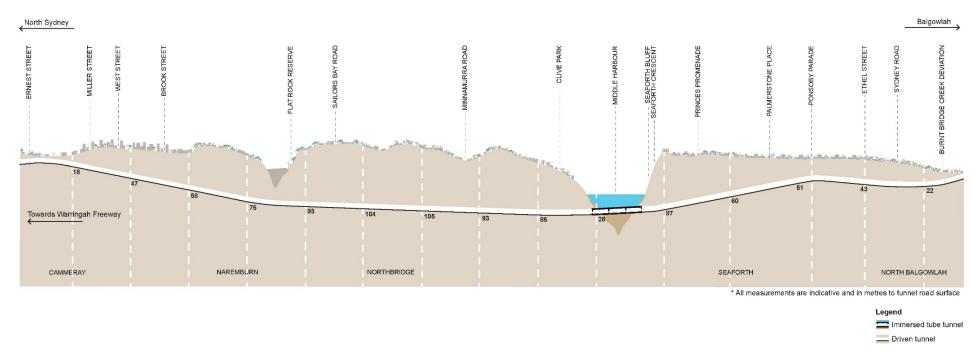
Indicative vertical alignment of the mainline tunnels and the ramp tunnel connection to the Burnt Bridge Creek Deviation (Cammeray to Balgowlah)
